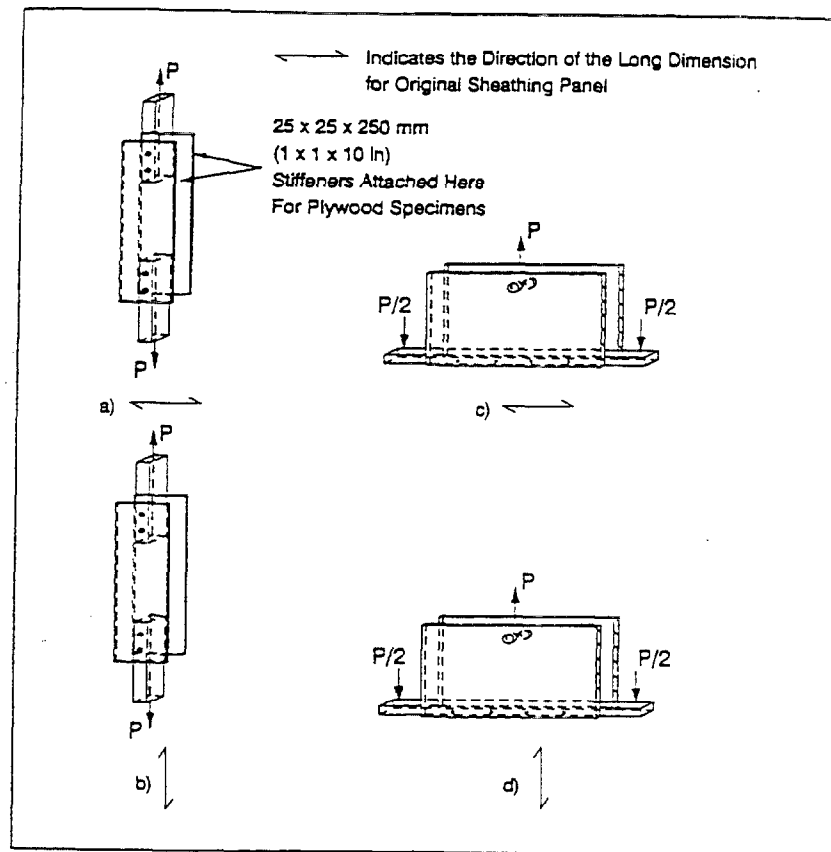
Sheathing Connection Test Specimen Configuration (after Dolan, 1989).
